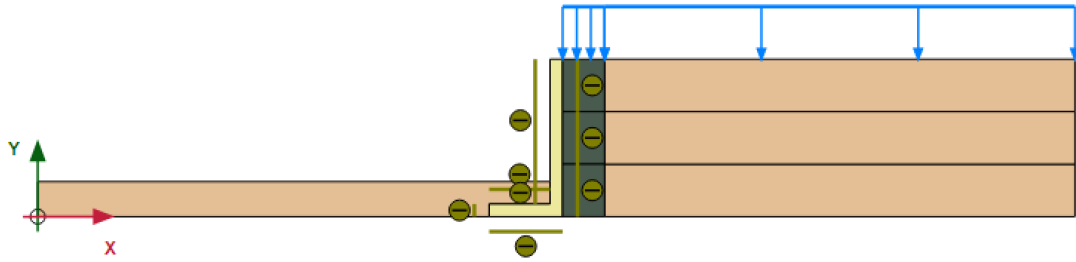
Retaining wall with no backfill slope and 1.2m width TDA backfill
